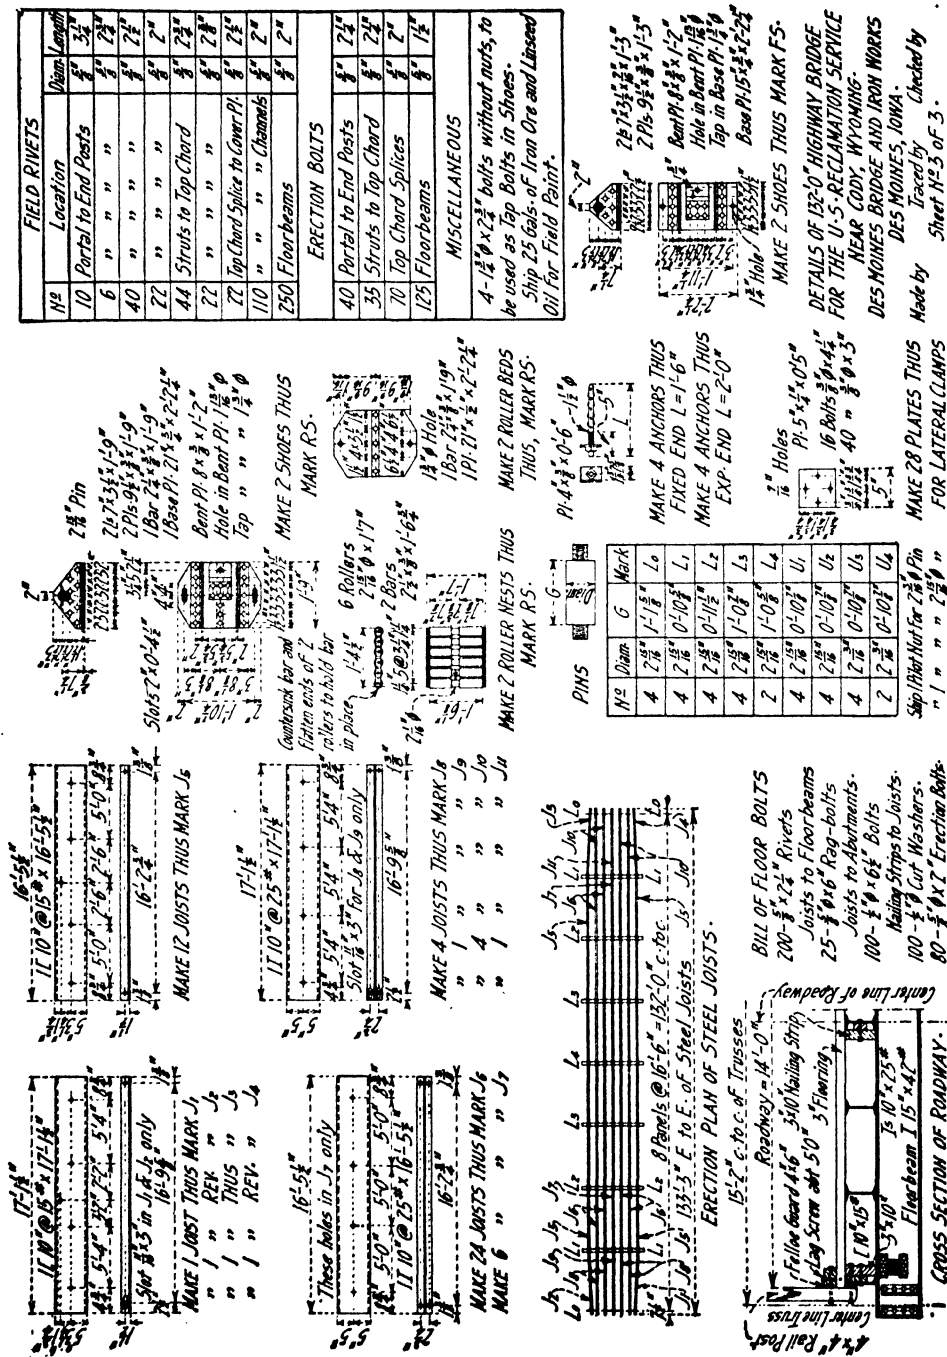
DETAILS OF A PIN-CONNECTED HIGHWAY BRIDGE.
